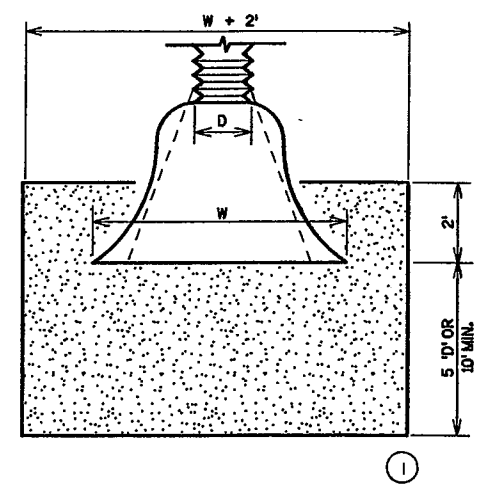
DETAIL FOR EXCAVATION BELOW SUBGRADE - CTH CB
